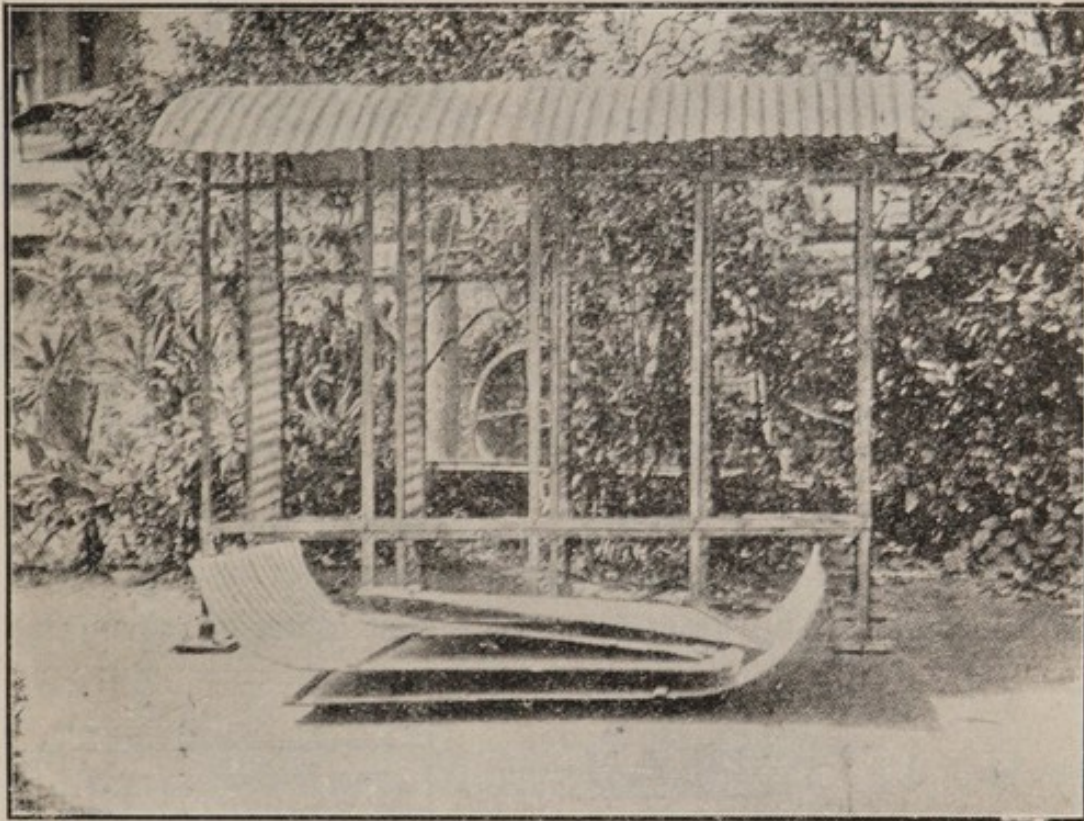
Patent Portable Latrine. Inside view with screens removed. (Civil and Sanitary Engineering Co., Calcutta).
